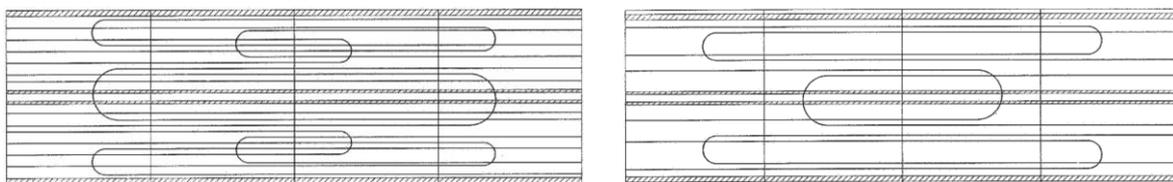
, PRESTRESSING DIAGRAM IN THE WIJKER TUNNEL (LEFT IS THE ROOF, RIGHT IS THE DECK)
